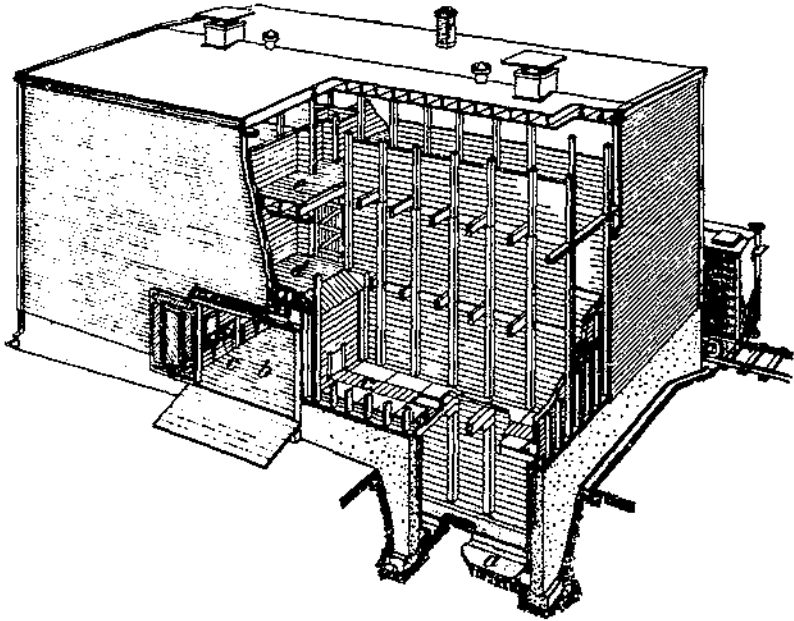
Cut-out perspective of new-type trackside storage; a, Basement bin-storage floor; b, driveway floor; c, first-floor bin storage; d, lower work floor; e, upper work floor.
